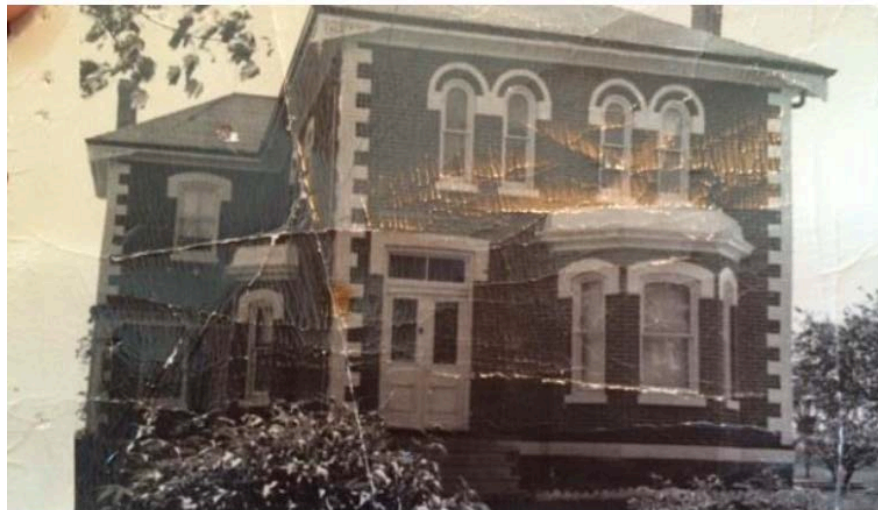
Original form and massing of the façade (east elevation) (AREA, HIA, fig. 44)
